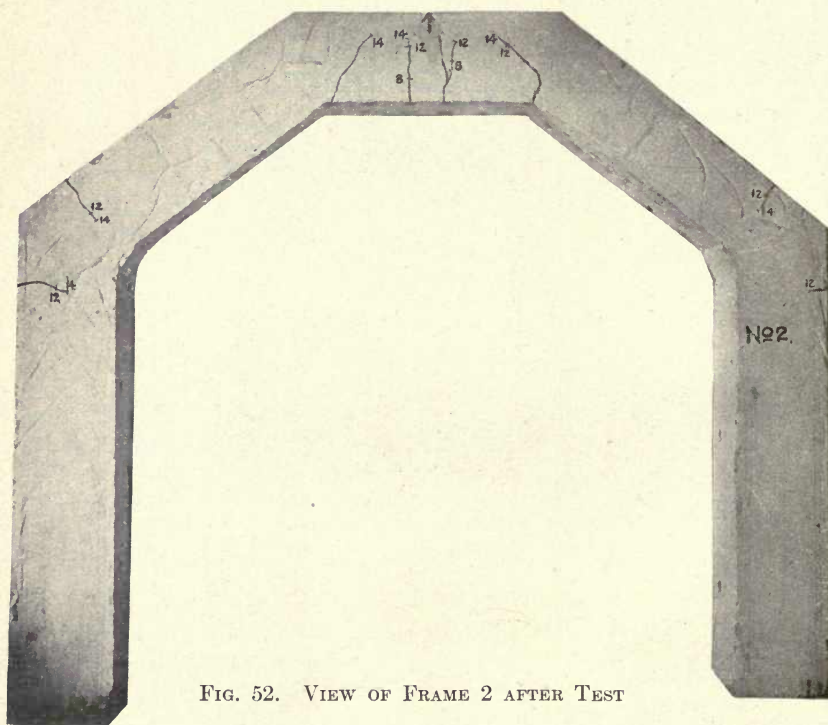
VIEW OF FRAME 2 AFTER TEST
